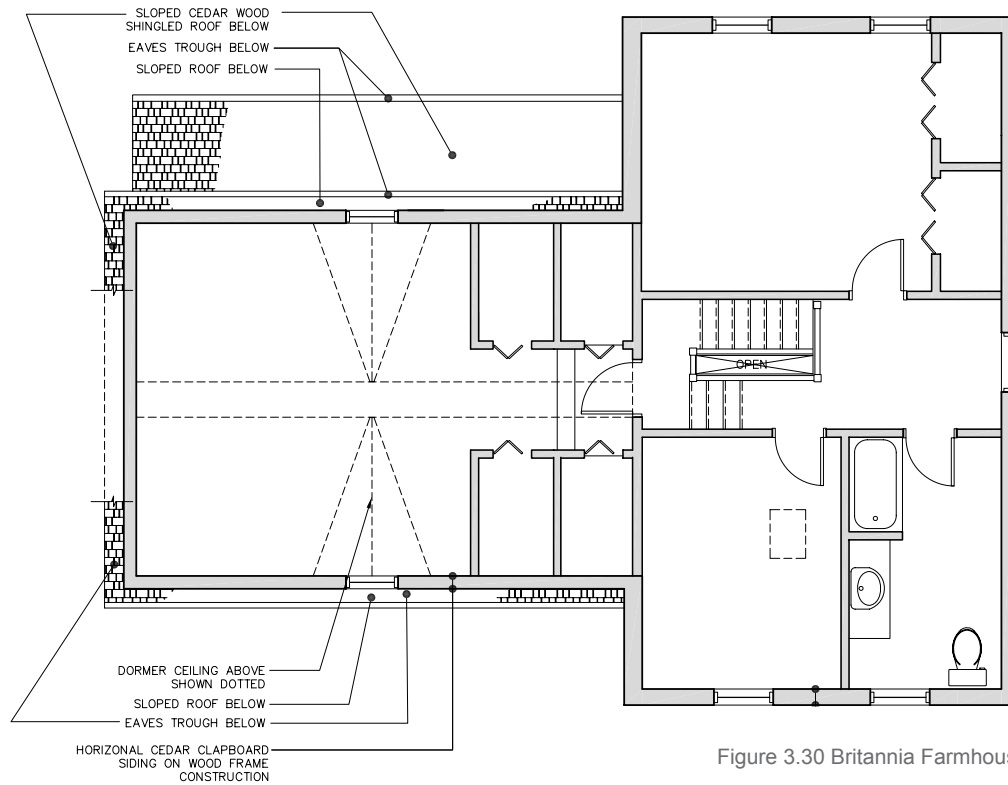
Britannia Farmhouse. Second Floor Plan.
